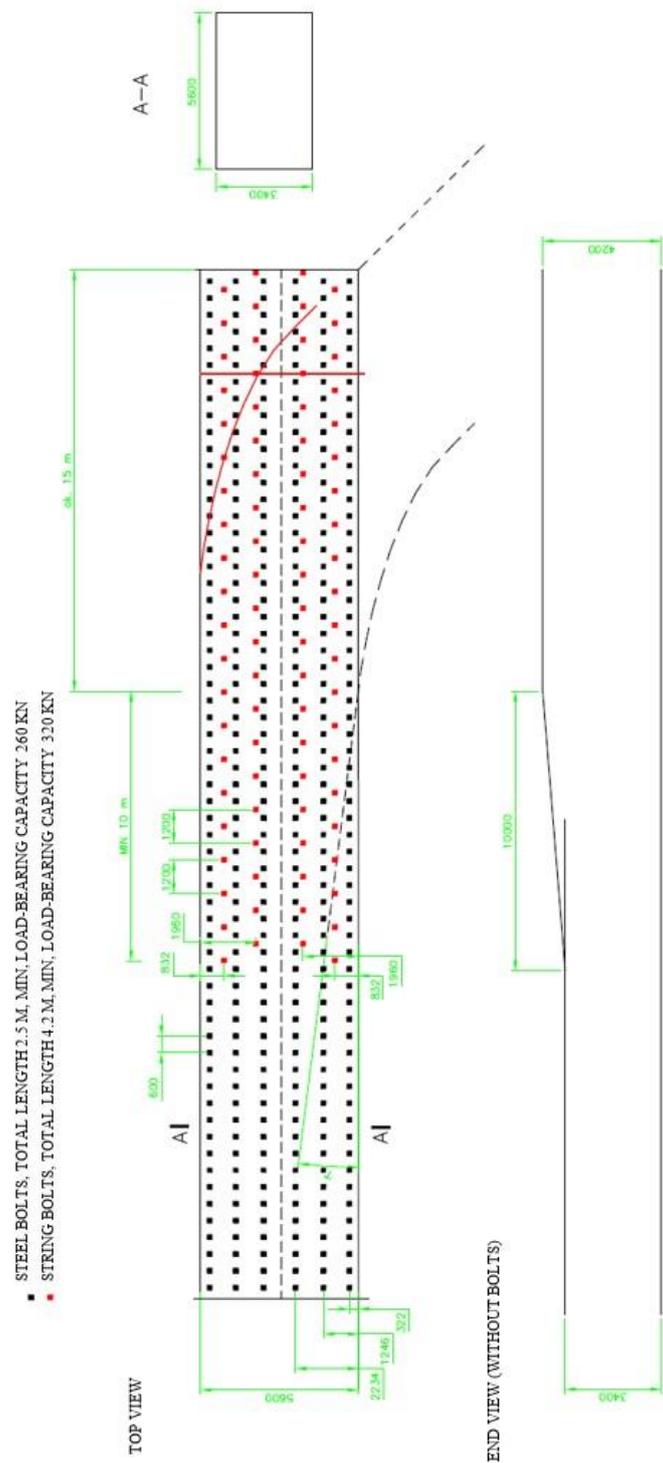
Driving method of the bend No. 1 – Stage I at the Bw-In test roadway [129]
